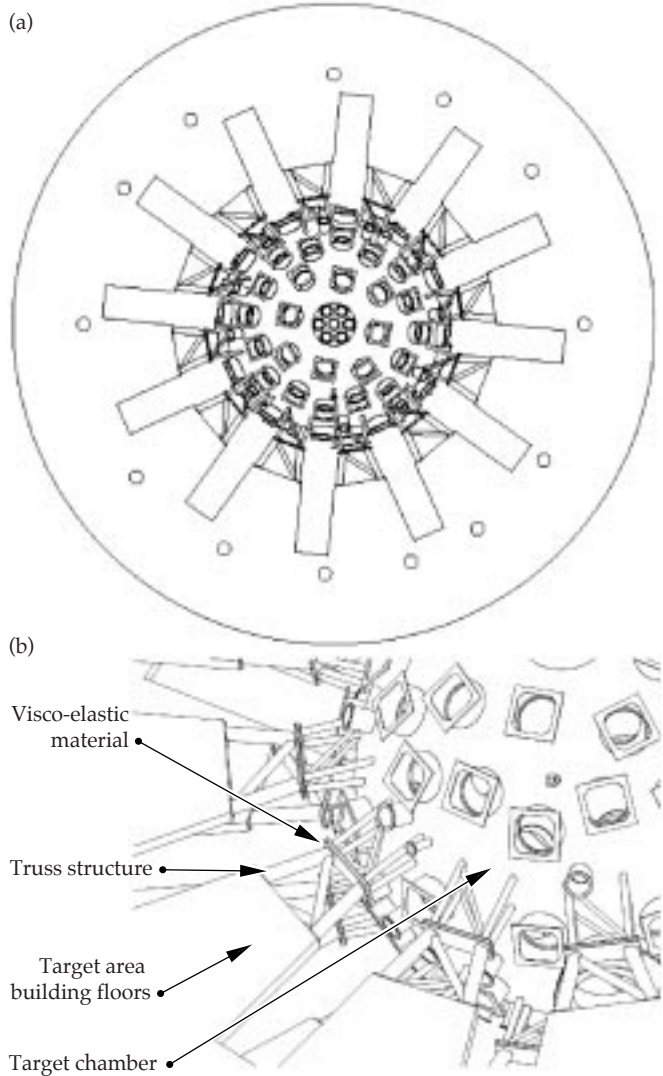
(a) The passive damping structures connect the target area building to the floors of the target chamber, a view from the top of the chamber. (b) Truss structures support a sandwich of steel plates and visco-elastic material. (40-00-1097-2290pb01)
